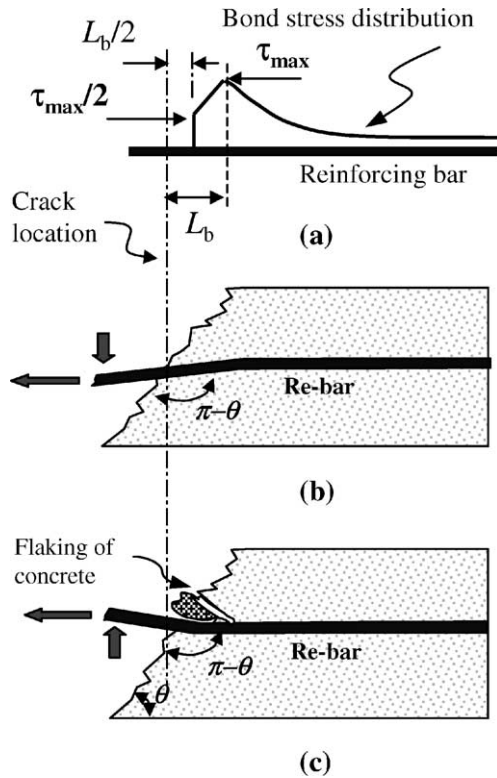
Deterioration of bond close to the crack: (a) bond in deterioration zone; (b) bar pushing at right angle; (c) pushing to the less confined surface.
